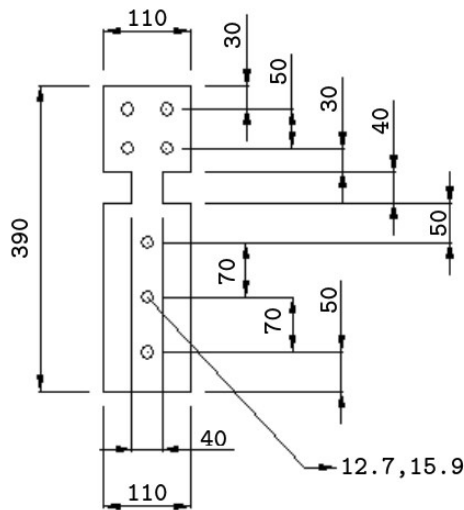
Geometry of the end plates and location of strain gauges (dimensions in millimeters) [52]
